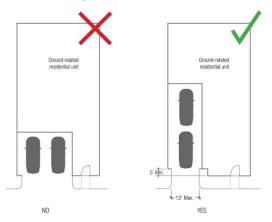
B.3.h. Driveways serving ground floor residential units shall be no more than 12' wide. Tandem parking is allowed. (This diagram is for illustrative purposes only. See Guideline 18-120-020.3.d.viii for stated requirements.)
